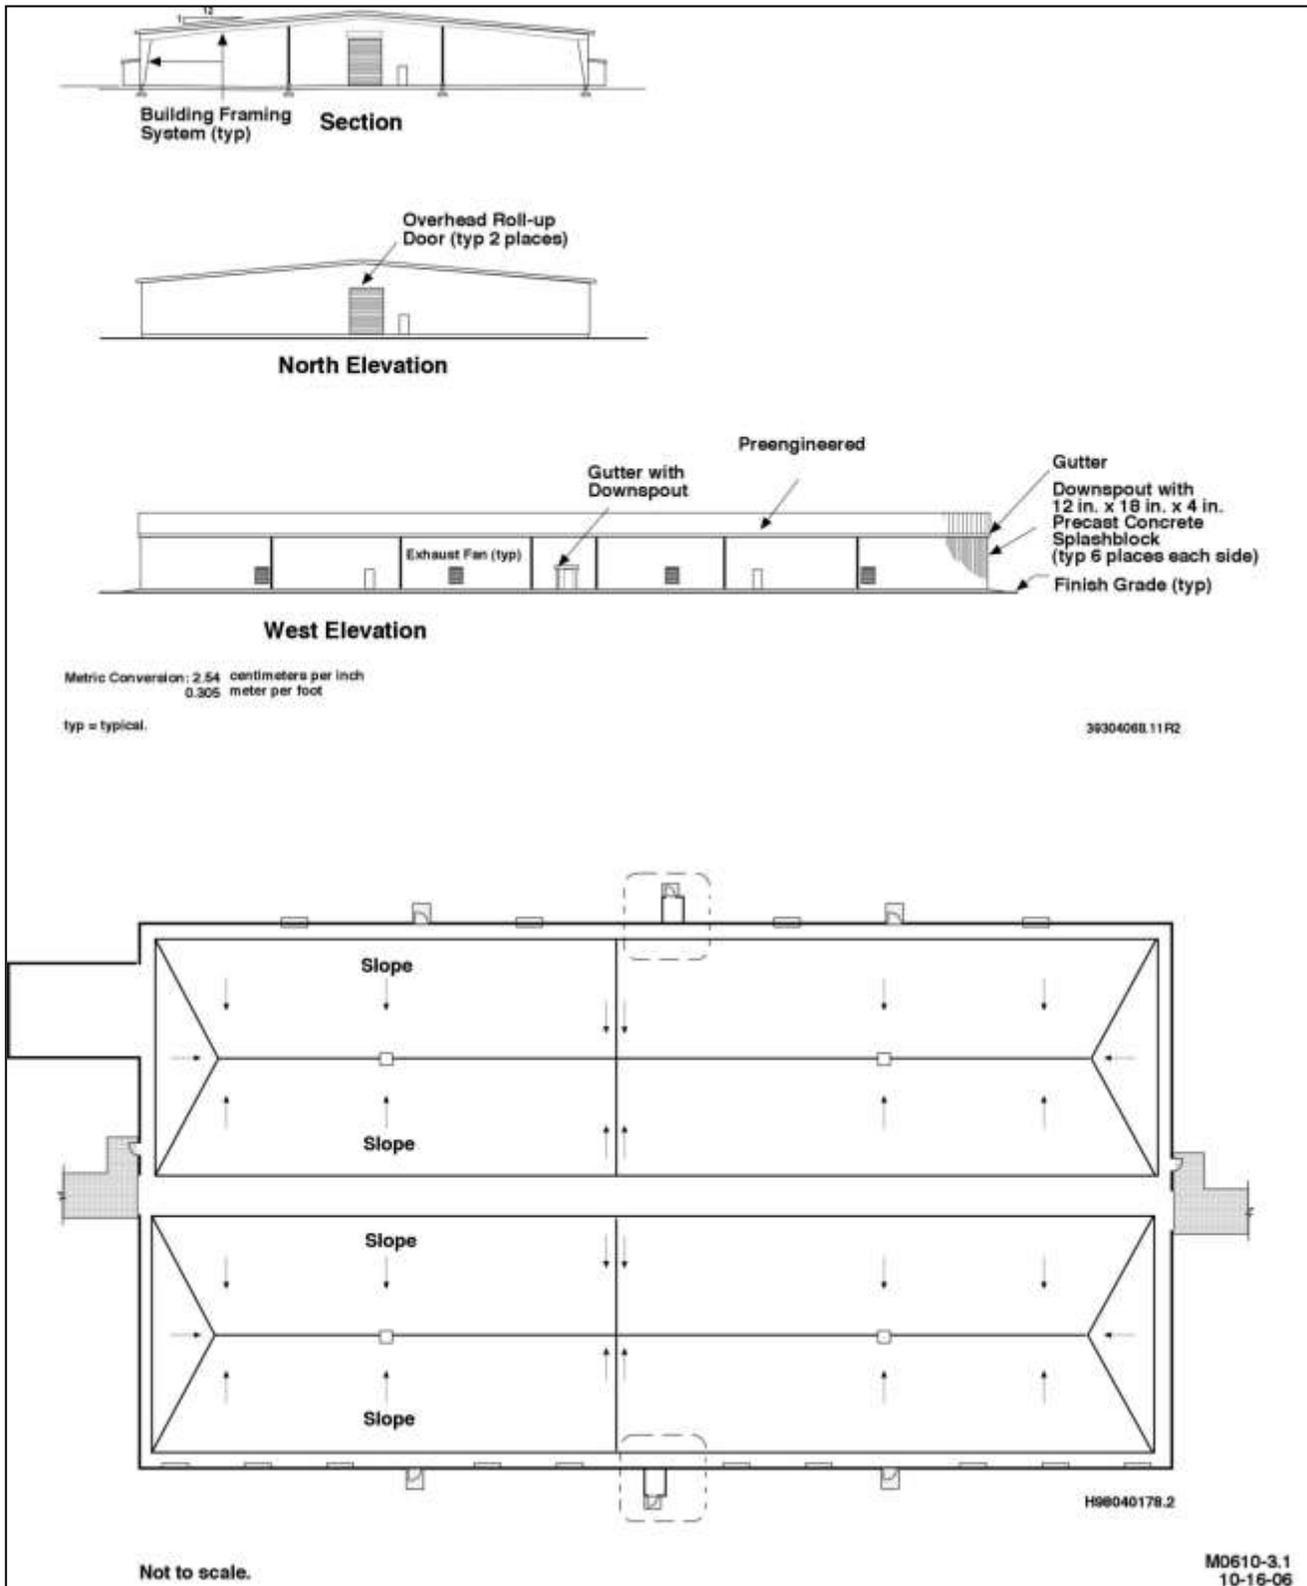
CWC 2401W Waste Storage Building Layout (Closing DWMU)
